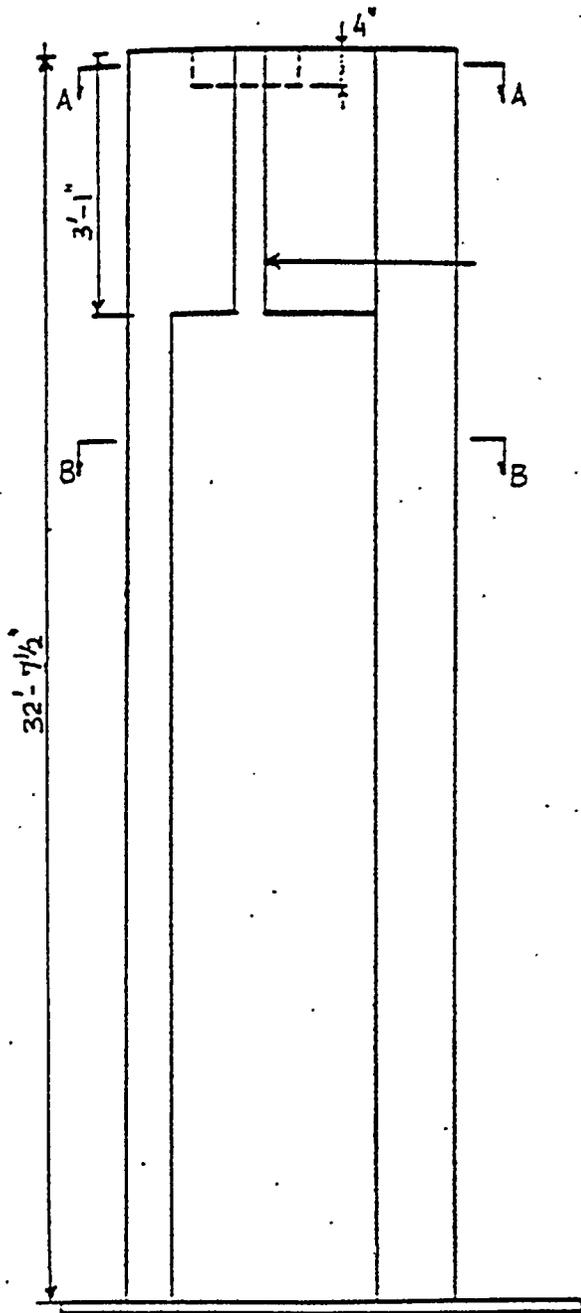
ROOF PLAN OF VAULT CPP-782 THRU CPP-784
